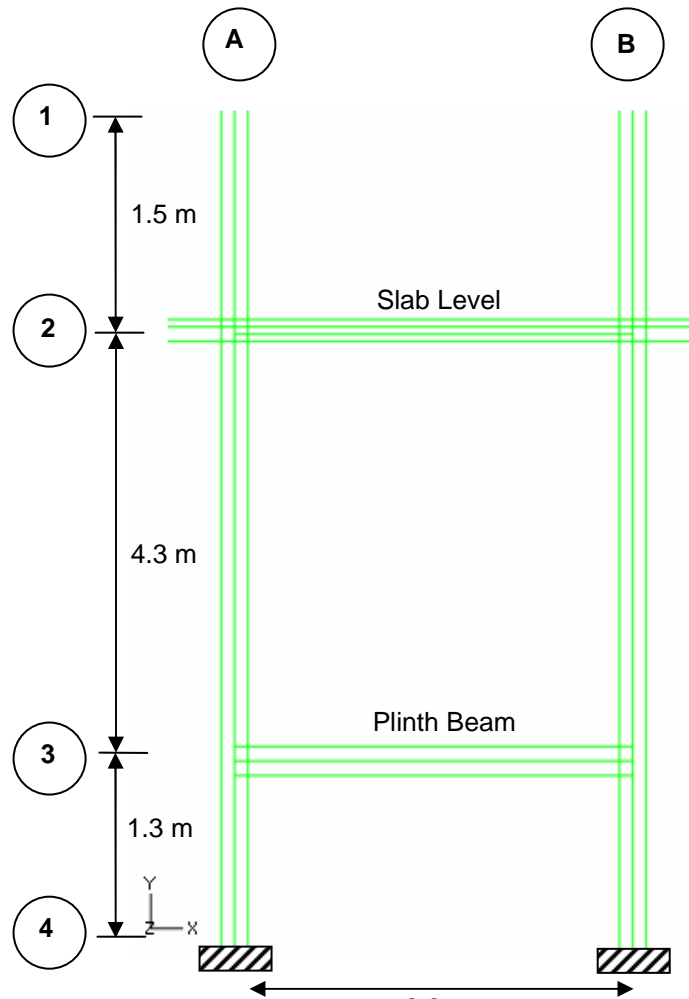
Schematic front view of the 1x1 bay reinforced concrete frame
